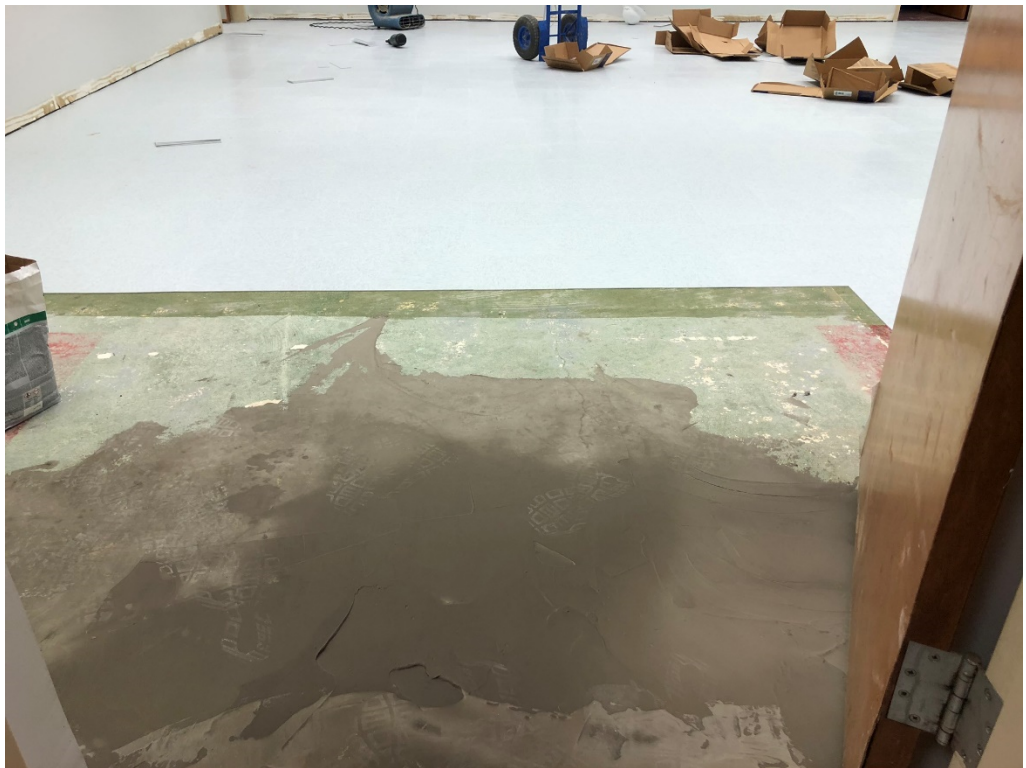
Floor Prep and Install in ongoing @ the Lower Level Hall
